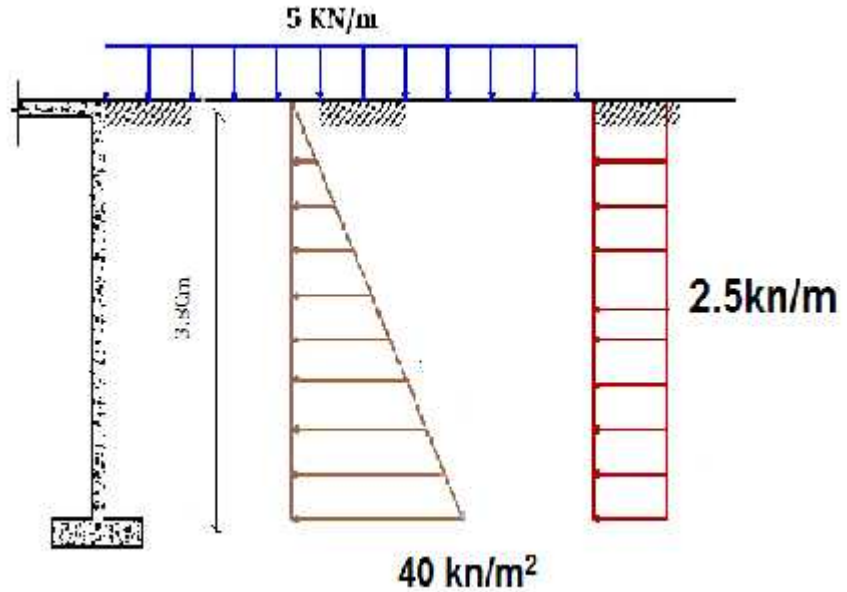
Loads On the Basement wall .(Col-22A)
